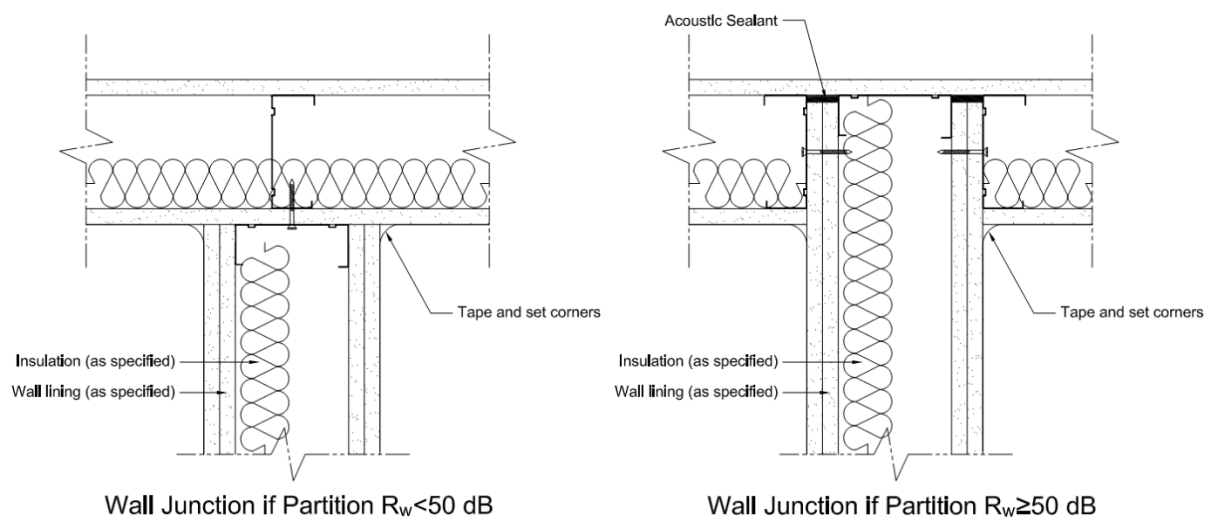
Wall / partition junction detail to minimise flanking path via walls.
